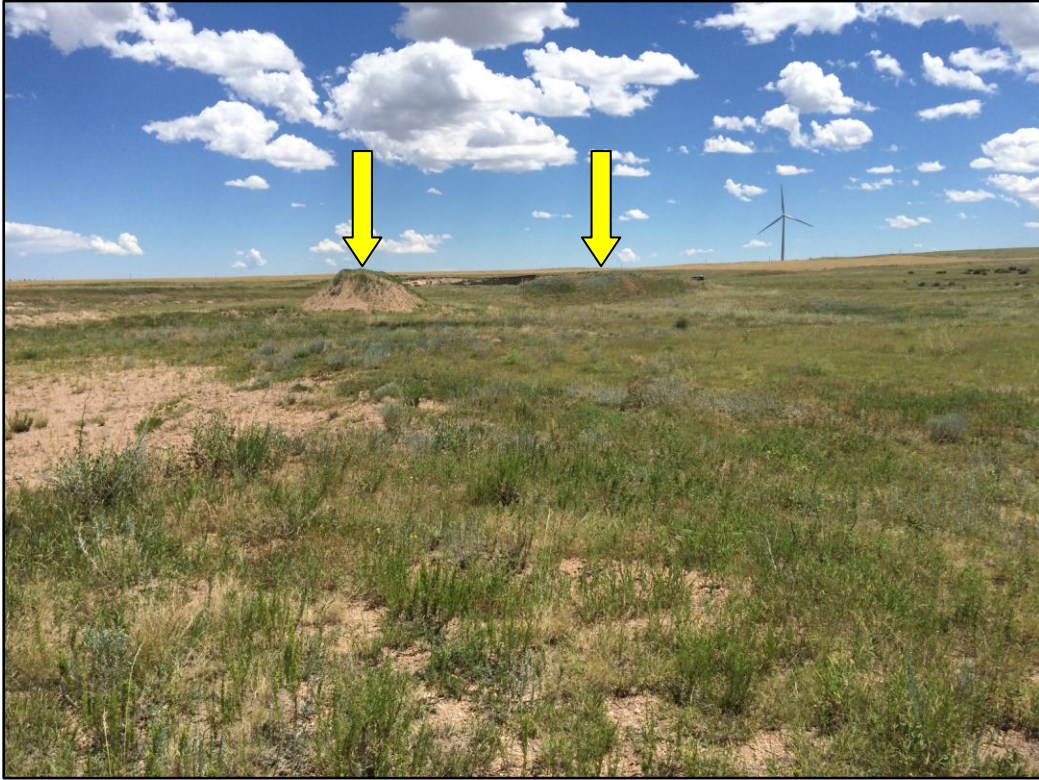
View looking east across loading area in southern portion of site, showing overburden and topsoil stockpiles stable with vegetative cover (indicated).
